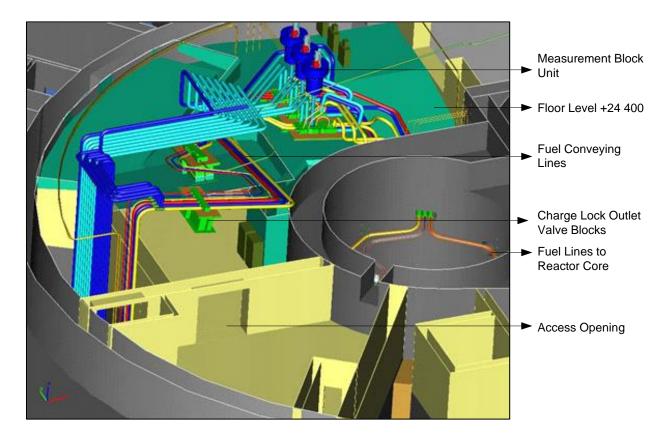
Burn-up measurement system and charge lock outlet valve blocks
